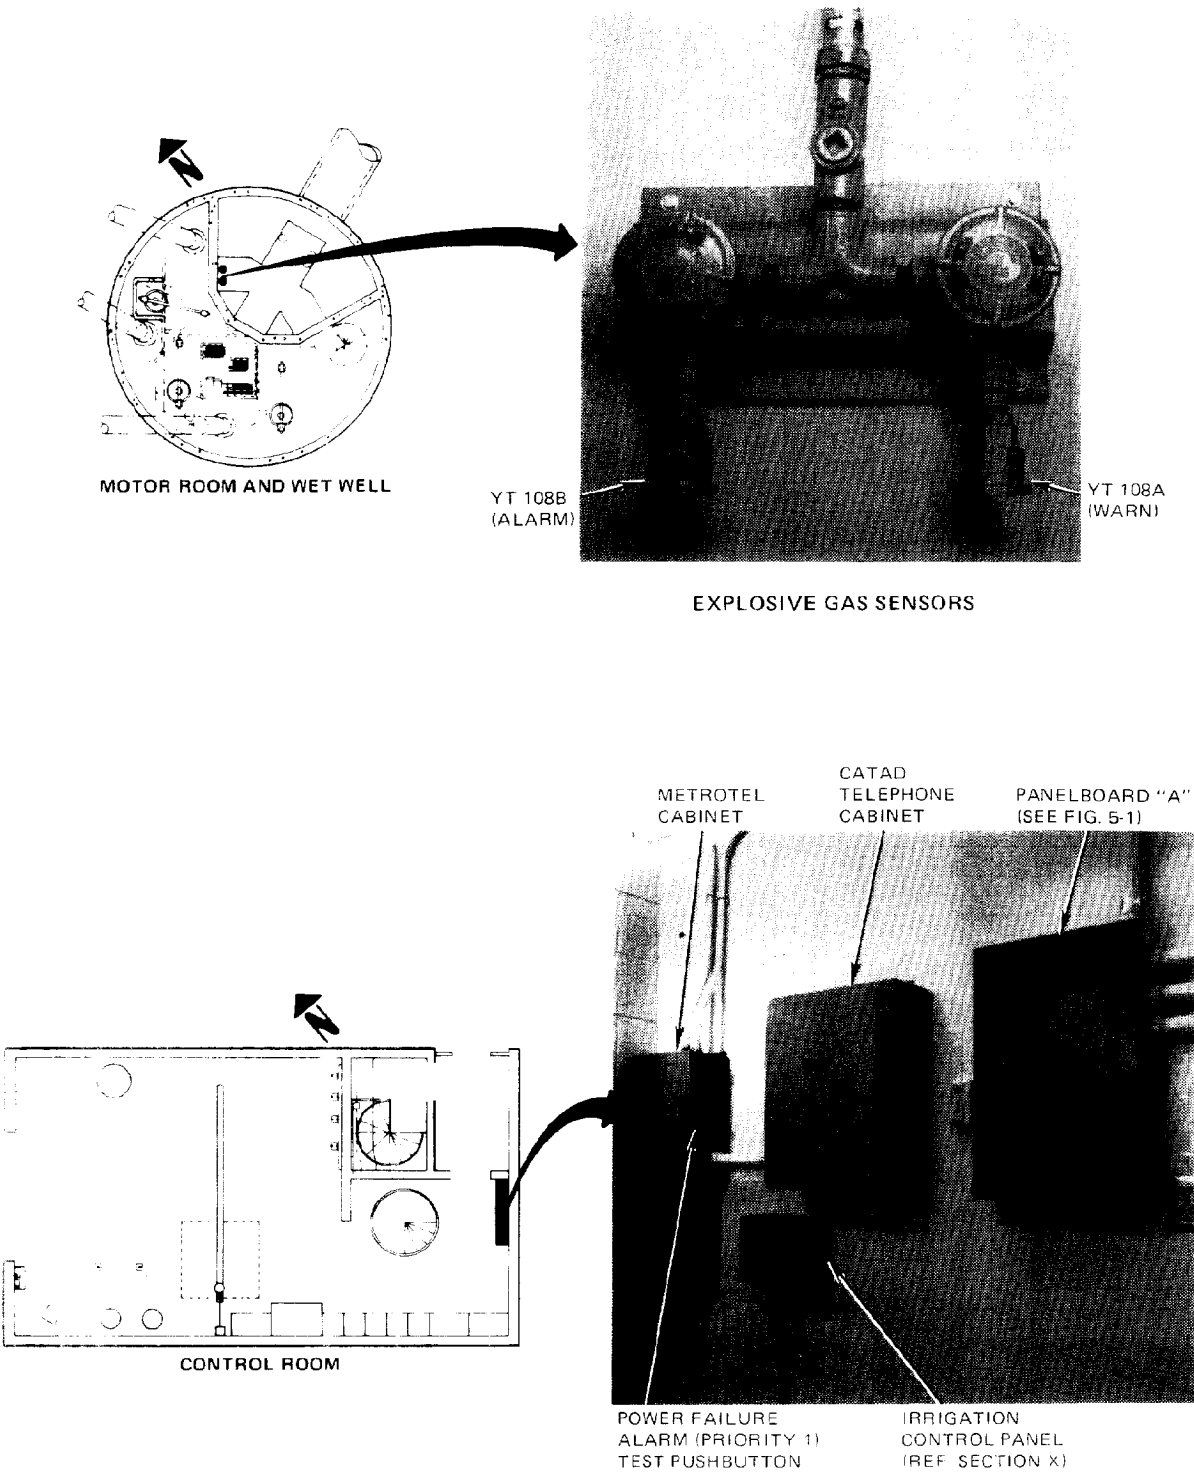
Alarm System Equipment (Sheet 2 of 2)
